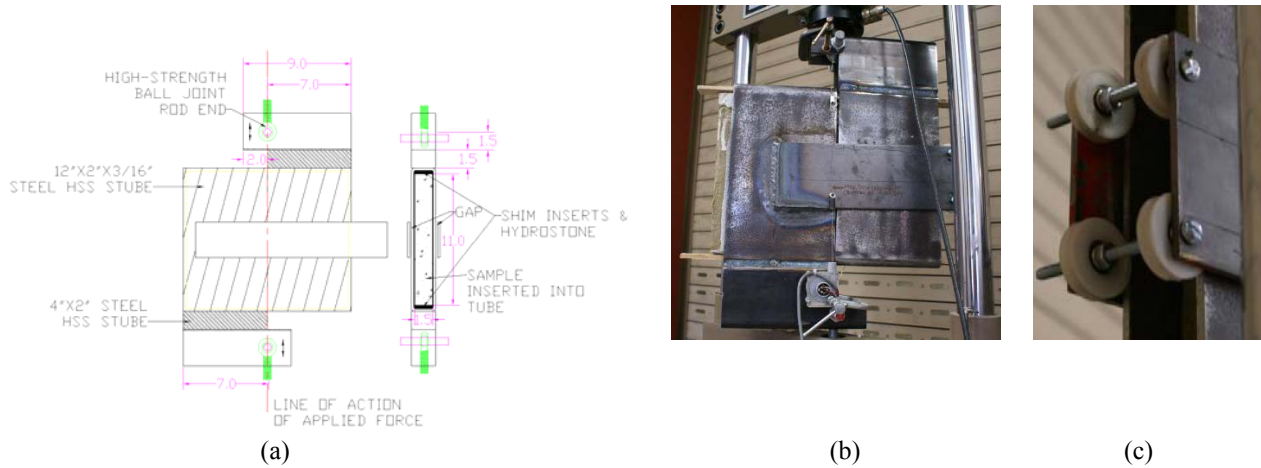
Panel shear test fixture (a) drawing, (b) elevation view, and (c) view of roller restraint.
